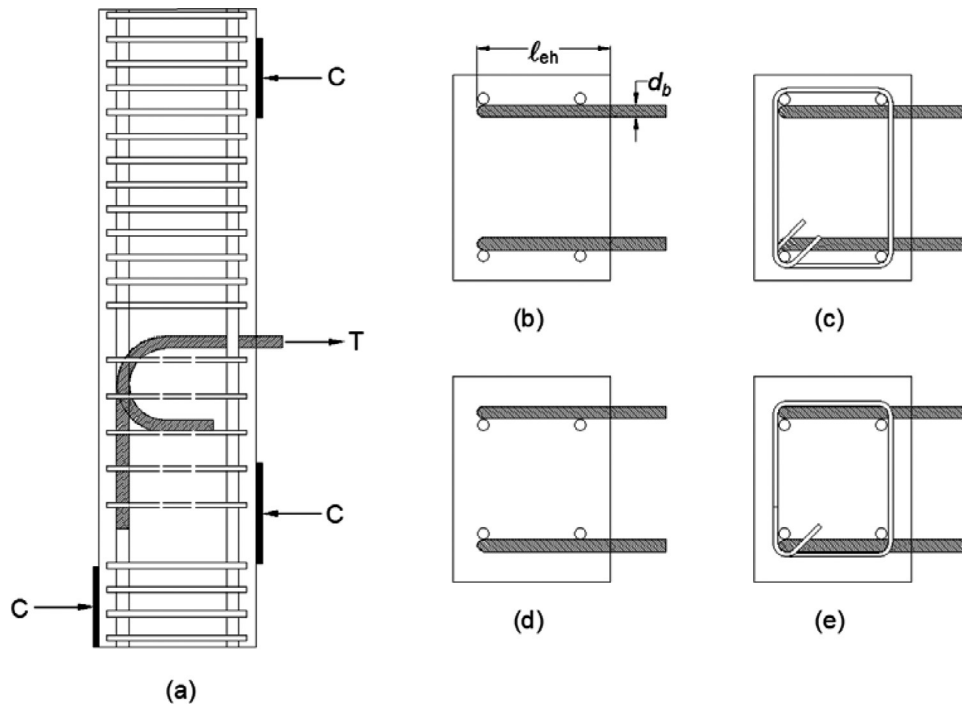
Schematic of typical specimen: (a) side view of specimen; (b) cross section of specimen with hooks inside column core and without confining reinforcement; (c) cross section of specimen with hooks inside column core and with confining reinforcement; (d) cross section of specimen with hooks outside column core and without confining reinforcement; and (e) cross section of specimen with hooks outside column core and with confining reinforcement.
